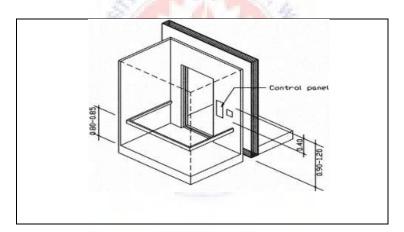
Height for mounting handrail inside elevator (Source: SOLIDERE 2004)
